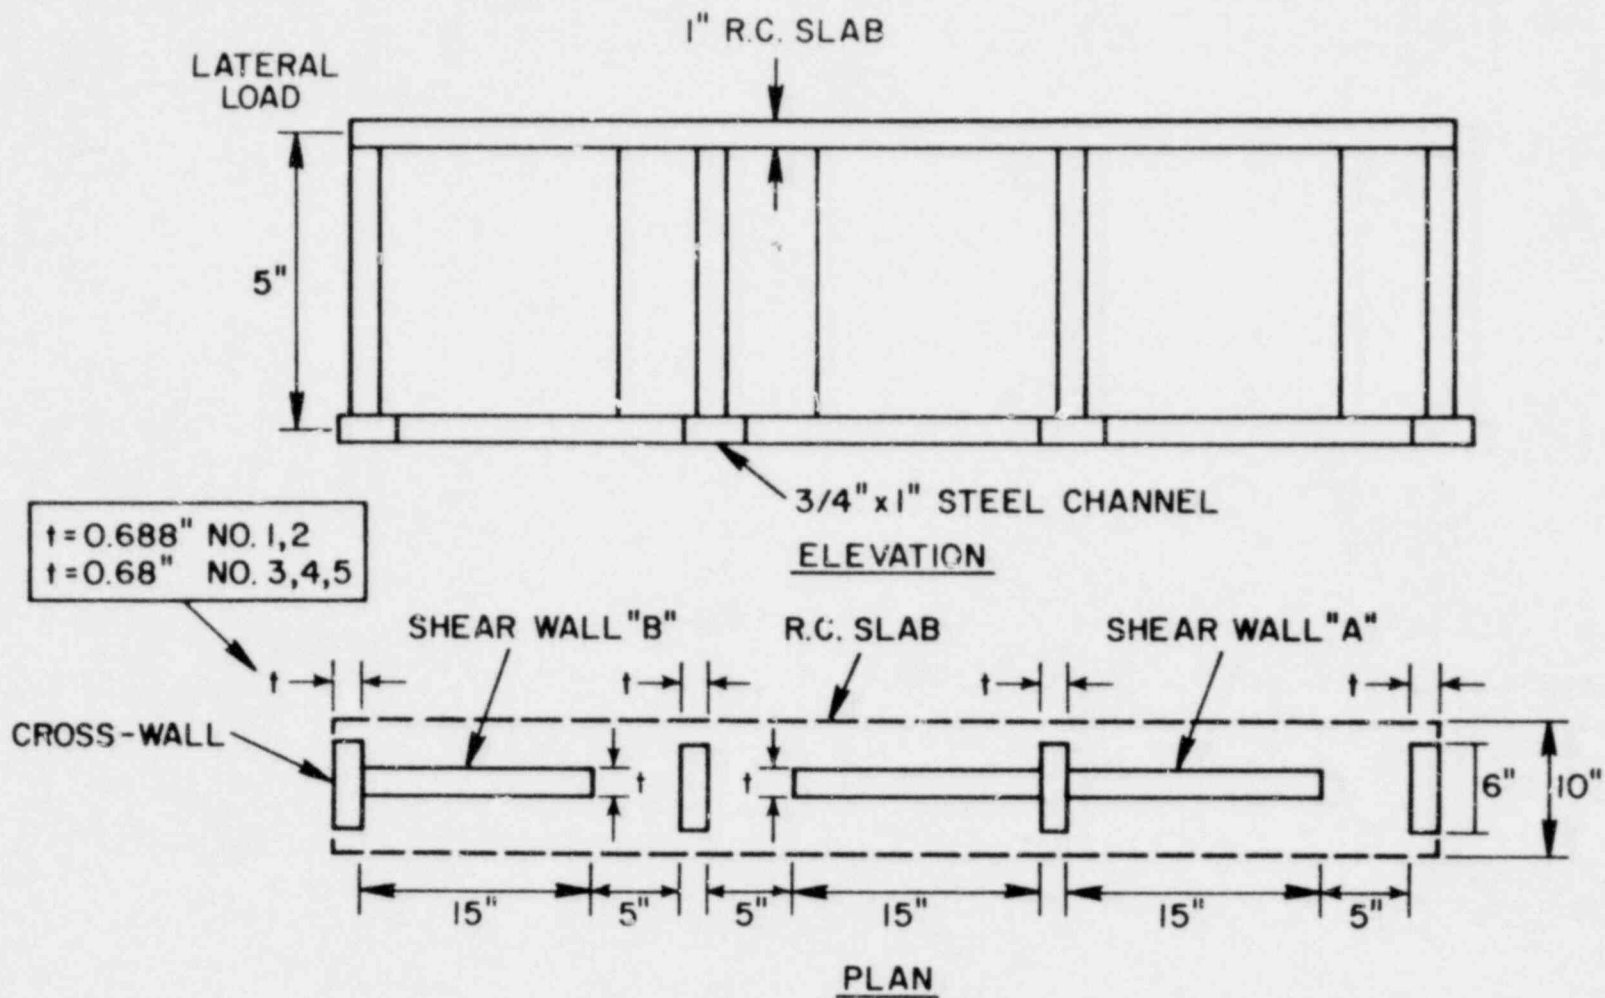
SHEAR WALL TEST STRUCTURE
